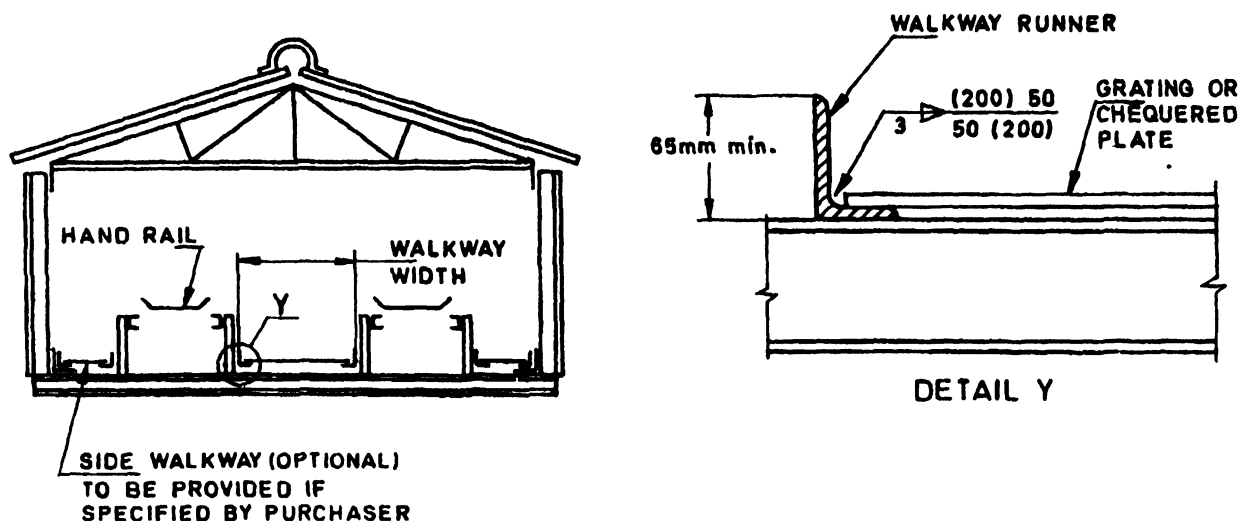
ARRANGEMENT IN DOUBLE CONVEYORS AND THEIR DESIGN APPROACH
